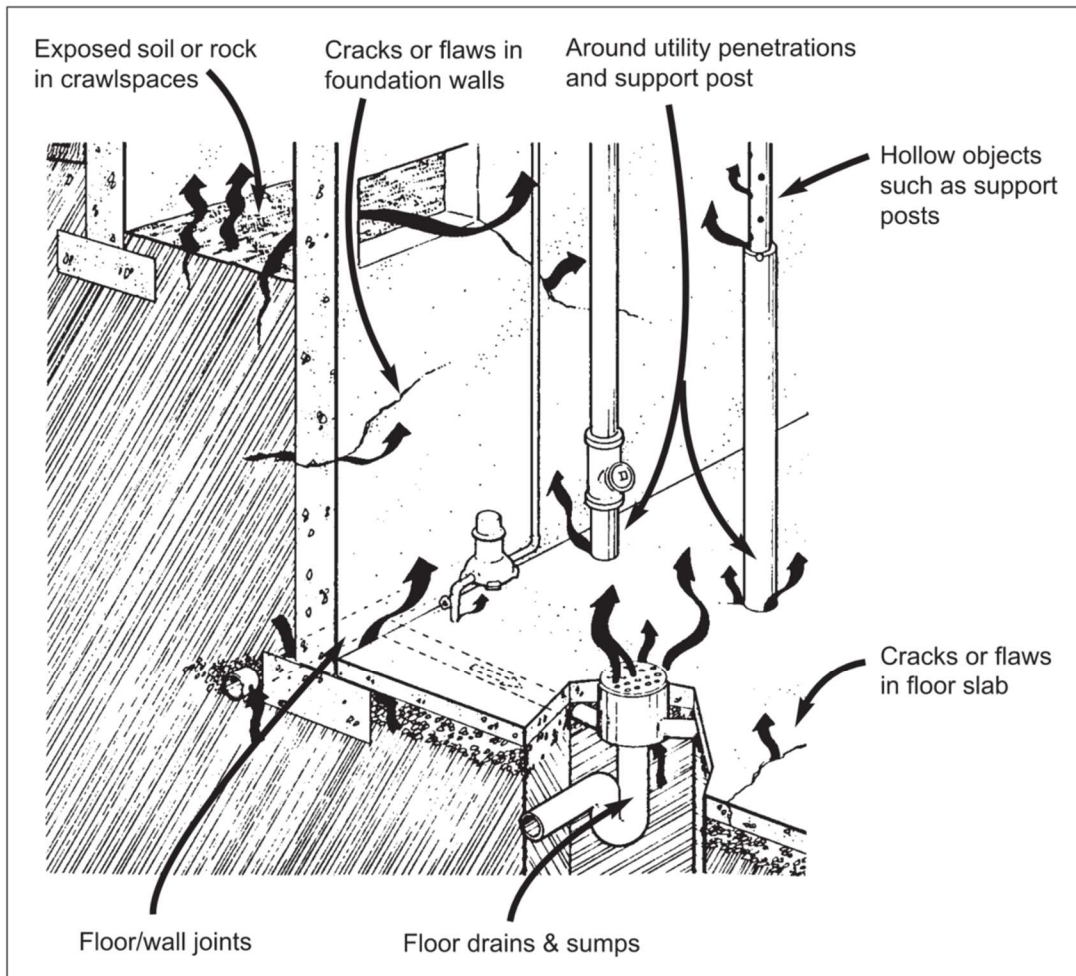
Potential entry points of radon in foundation walls and poured concrete floors (CAN/CGSB-149.12-2017)
